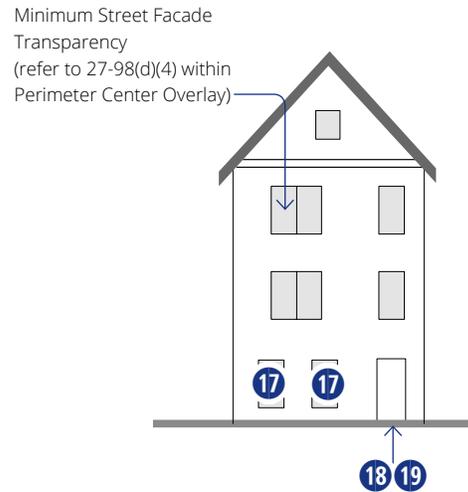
Detached House Building: Street Facade Design Requirements
